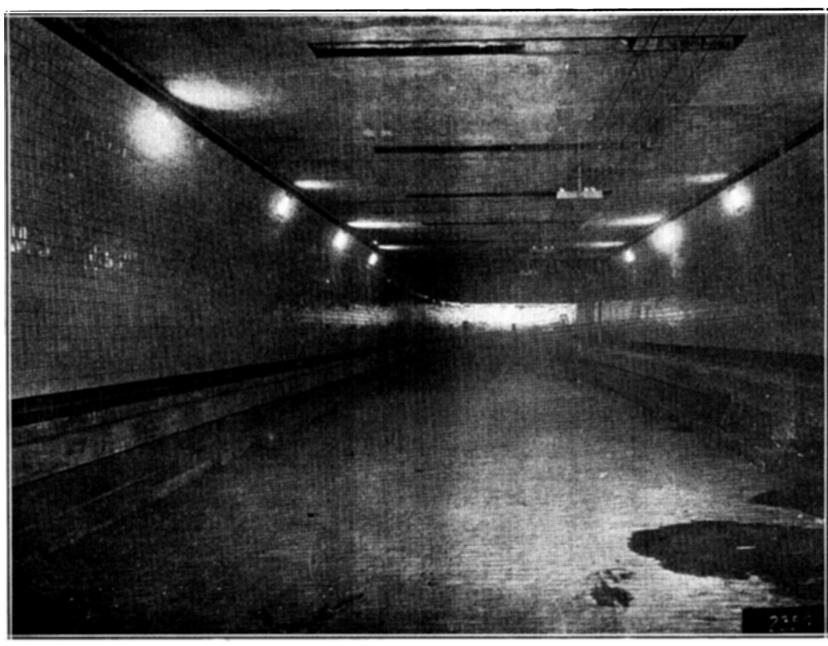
Completed Tiling in North Tunnel, New York Approach. Contract No. 7.
